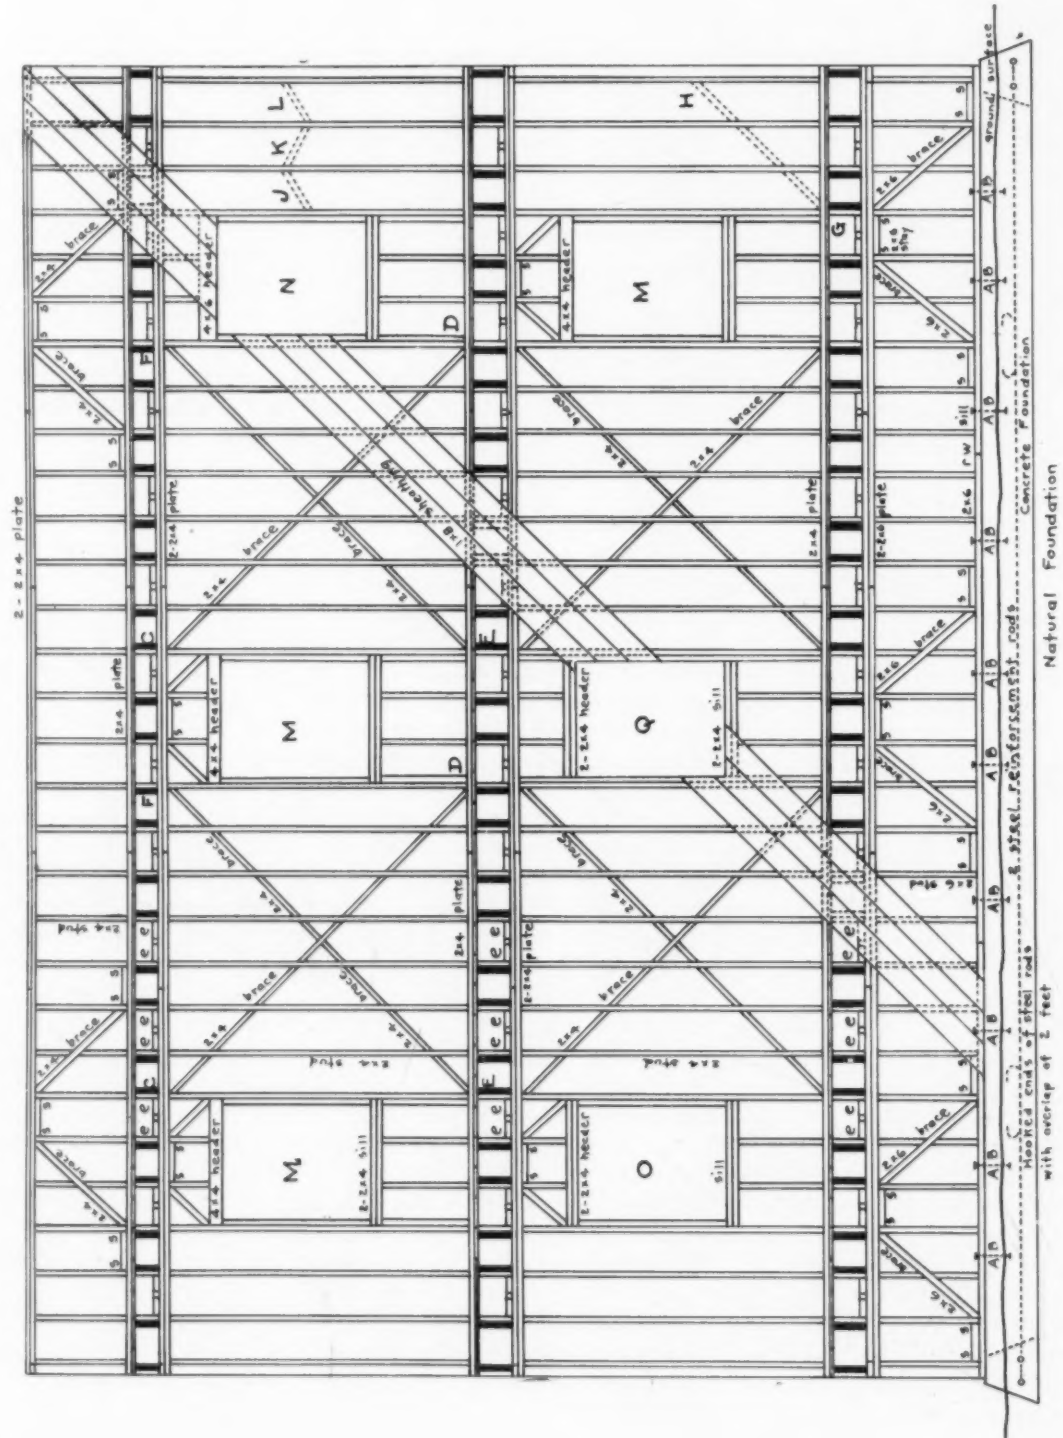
CONSTRUCTION DETAIL OF THE ELEVATION OF A WOODEN FRAME BUILDING
